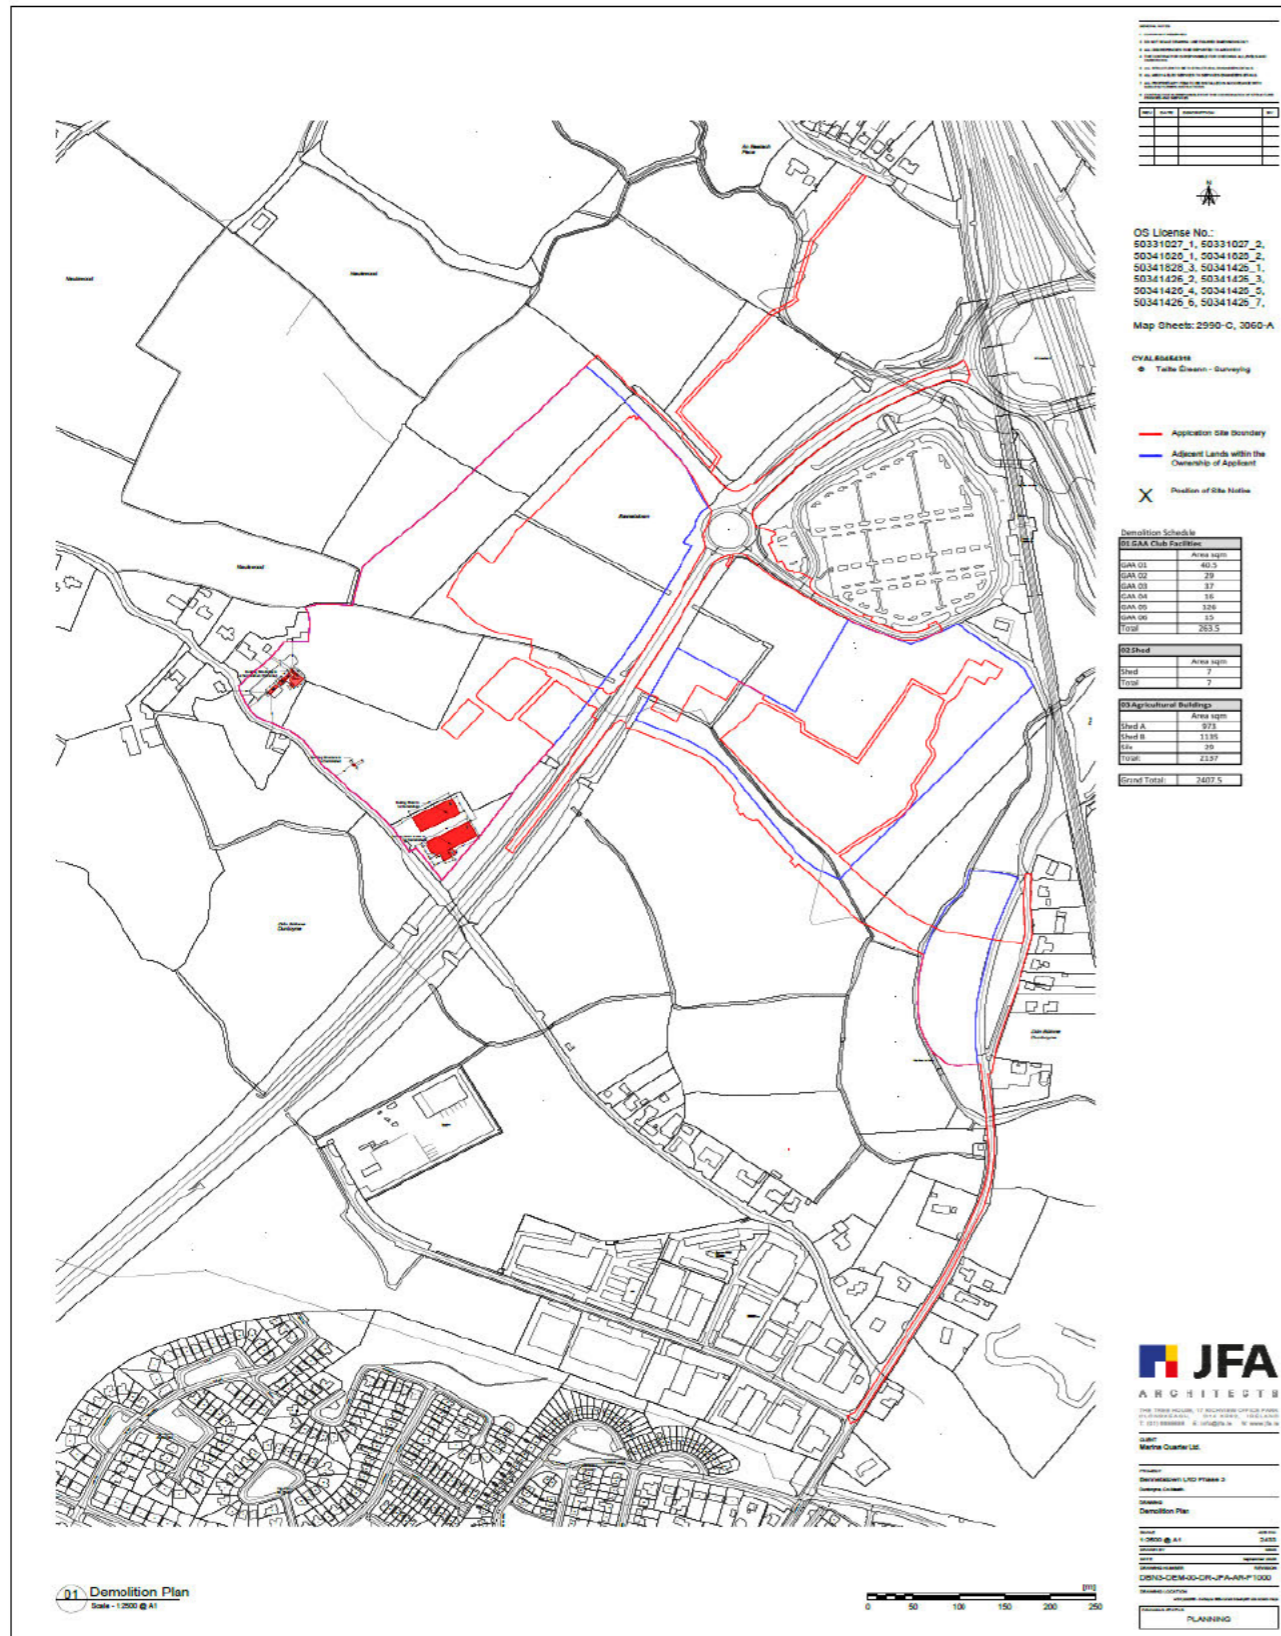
Proposed Site Demolition Layout (Source: John Fleming Architects)
